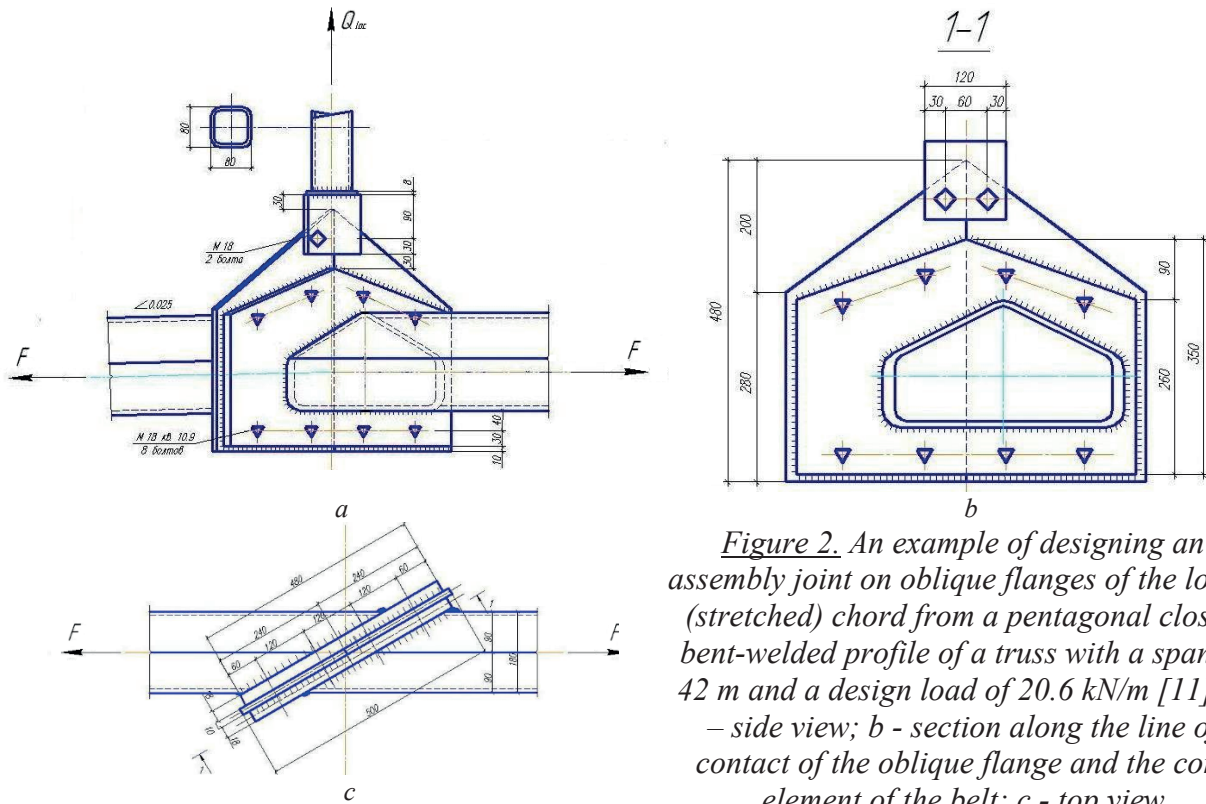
An example of designing an assembly joint on oblique flanges of the lower (stretched) chord from a pentagonal closed bent-welded profile of a truss with a span of 42 m and a design load of 20.6 kN/m [11]: a - side view; b - section along the line of contact of the oblique flange and the core element of the belt; c - top view
